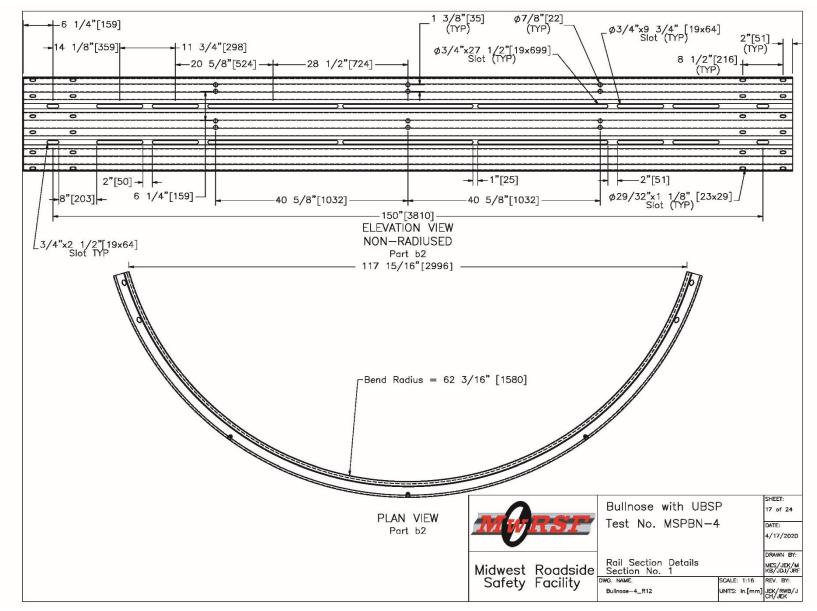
Rail Section Details Section No. 1, Test No. MSPBN-4
